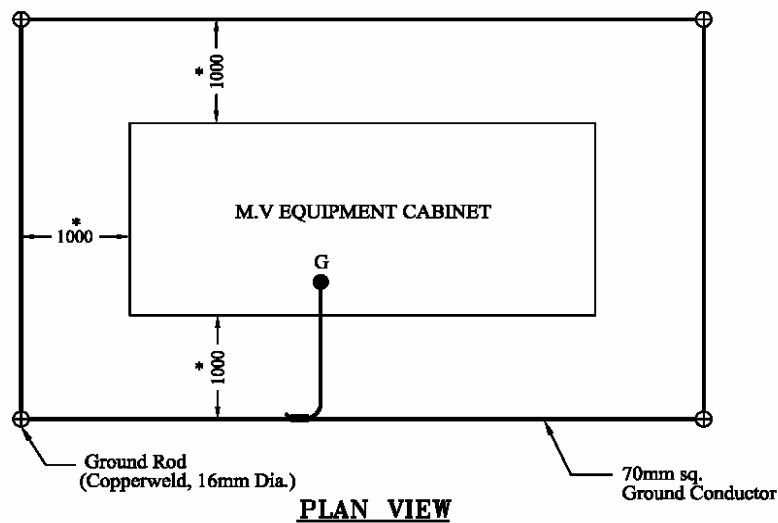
TYPICAL BONDING AND GROUNDING ARRANGEMENT
